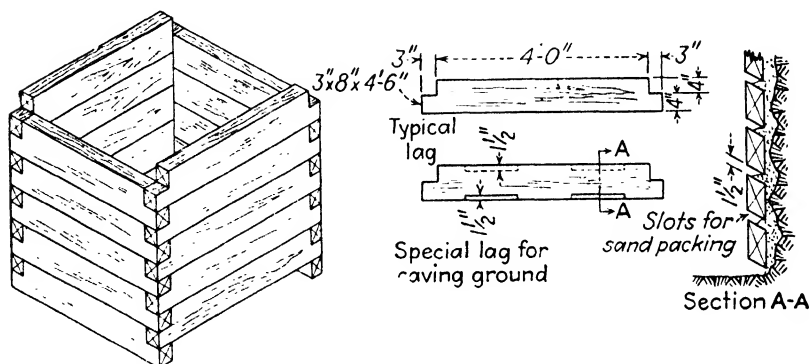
Cribbed-well method of shaft sinking in soft ground.
